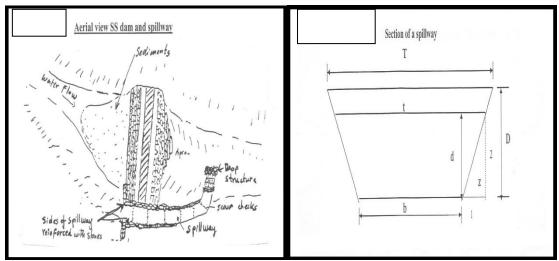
Aerial View of SSD and Spill way (left) and layout of spillway (right) Source: BoA, 2003
